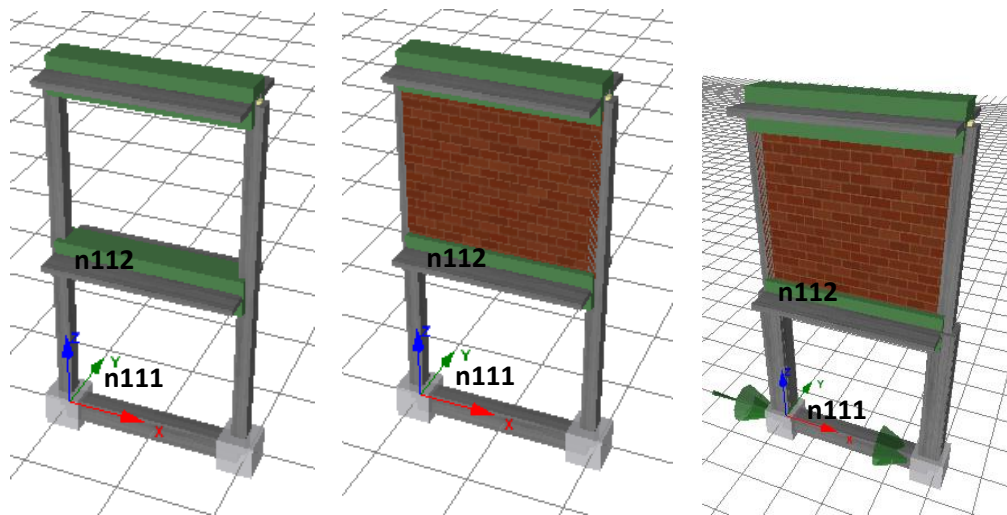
(a) Bare Frame, (b) Pilotis Type Frame, (c) Strengthened Pilotis Type Frame
